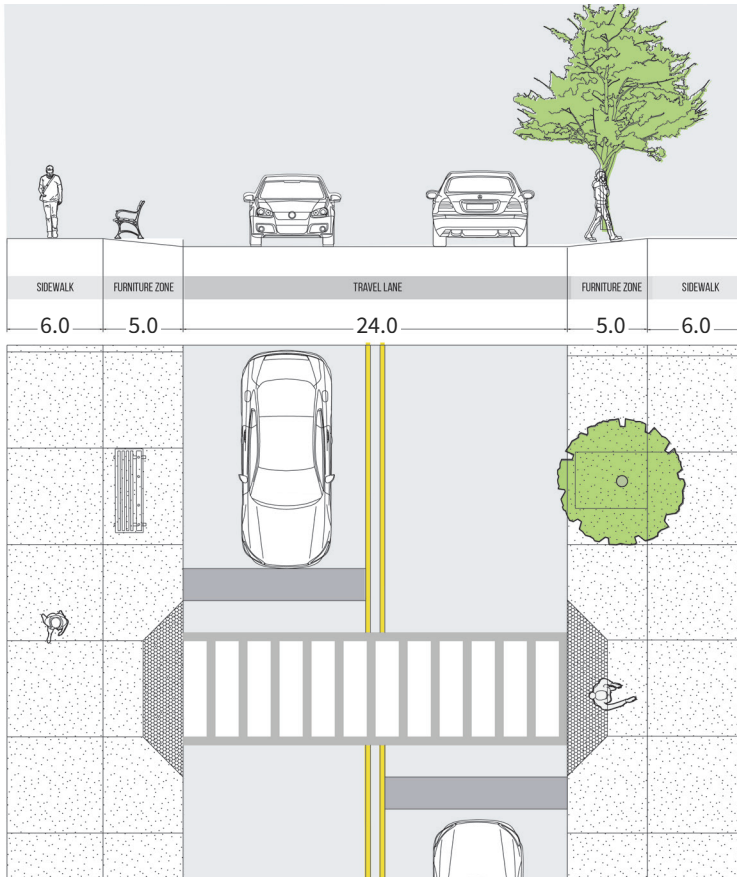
5. Typical crosswalk section, showing the travel lane, sidewalk, and furniture zone. Courtesy of BREC.
